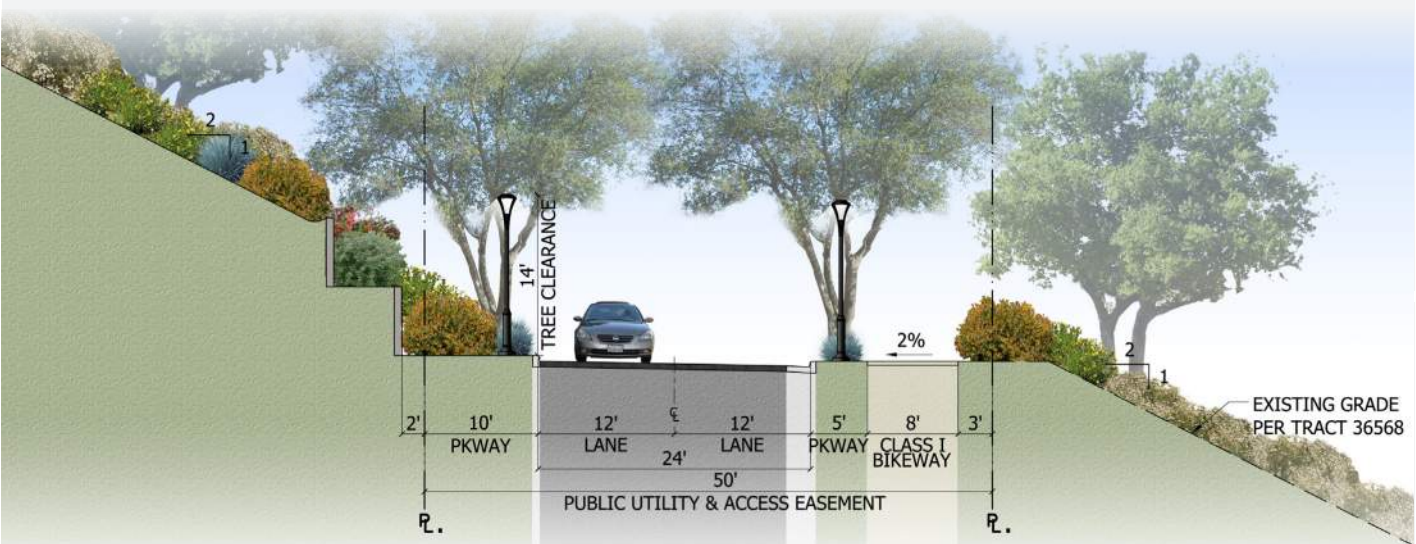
Street Section - B Street North with Class 1 Bikeway (Private, TTM lots L and M)
